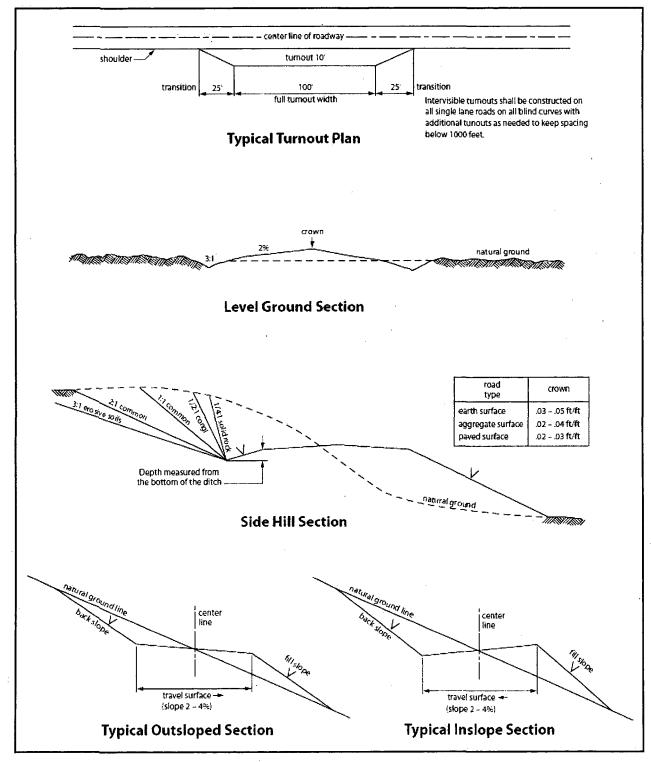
Cross-sections and plans for typical road sections representative of BLM resource or FS local and higher-class roads.
